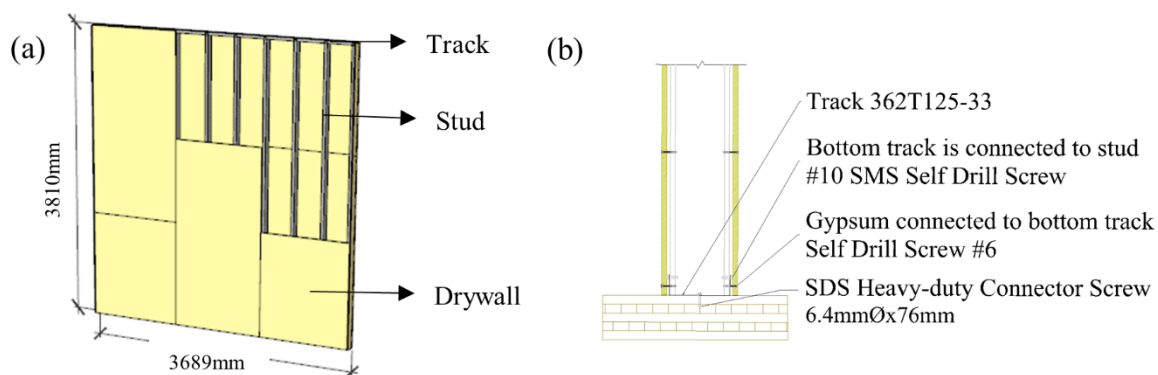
(a) Partition walls components - 3D view, (b) Detail of connection of walls to the bottom diaphragm
